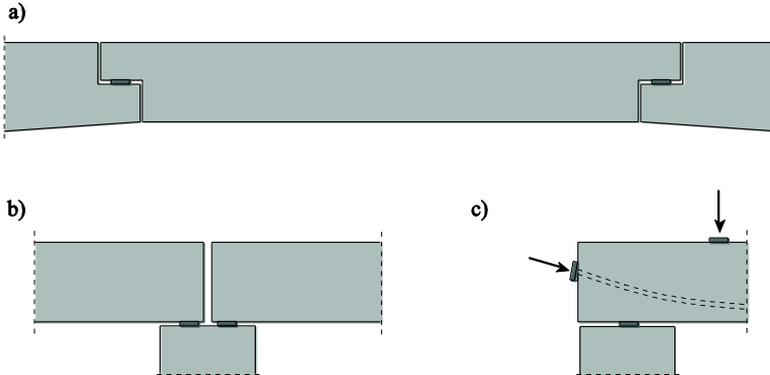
Discontinuity regions typical for concrete bridges a) dapped end b) insufficient anchorage c) concentrated forces due to prestressing and traffic
